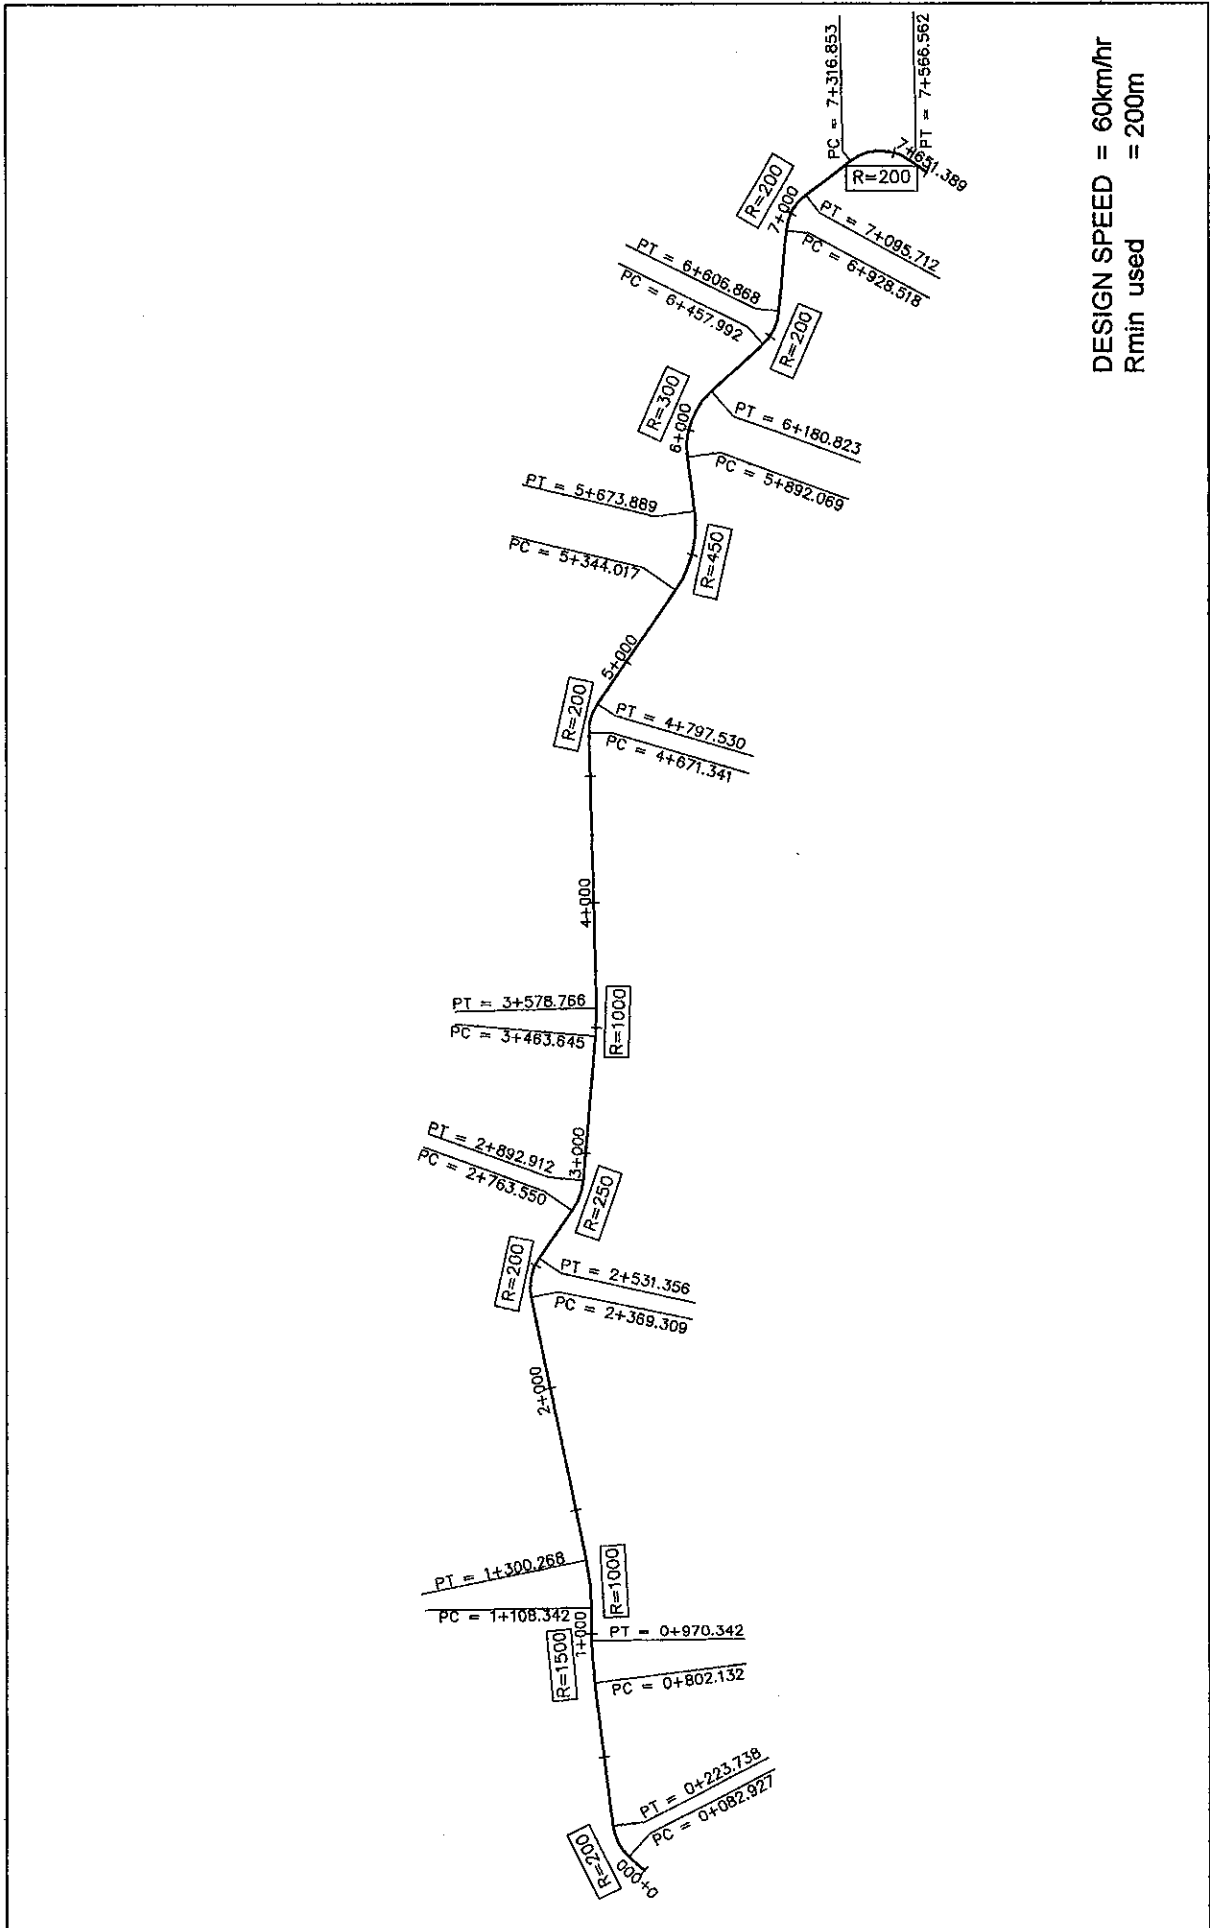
HORIZONTAL ALIGNMENT : WESTERN COASTAL ROAD
